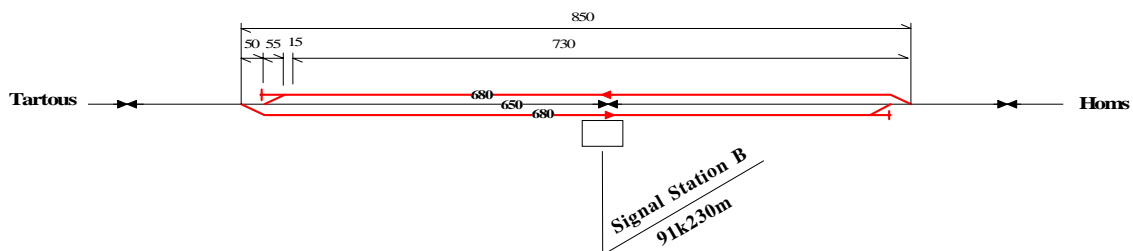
Station Yard Track Layout of Signal Station B
